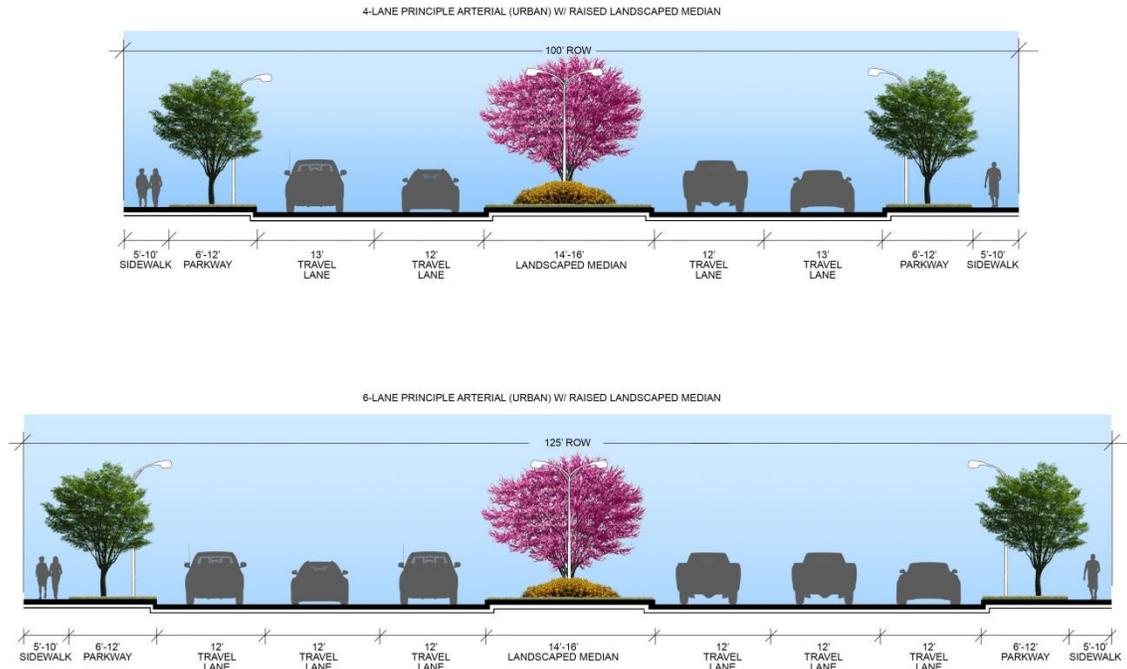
Typical Sections of Principal Urban Arterial Roadways
